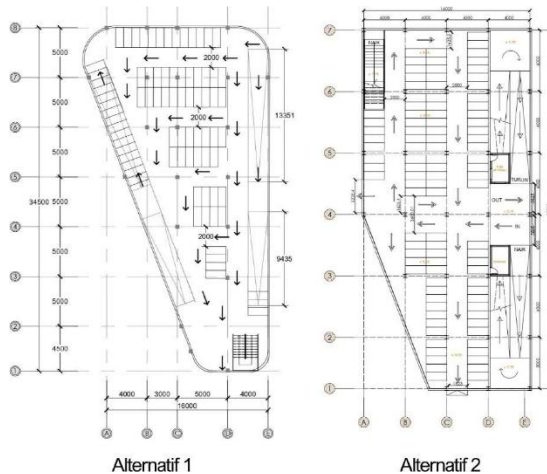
Comparative site-plan configuration of Design Alternative 1 and Alternative 2 showing the application of Parking Space Unit (SRP) standards, circulation layout, and structural module alignment (Author, 2025)
